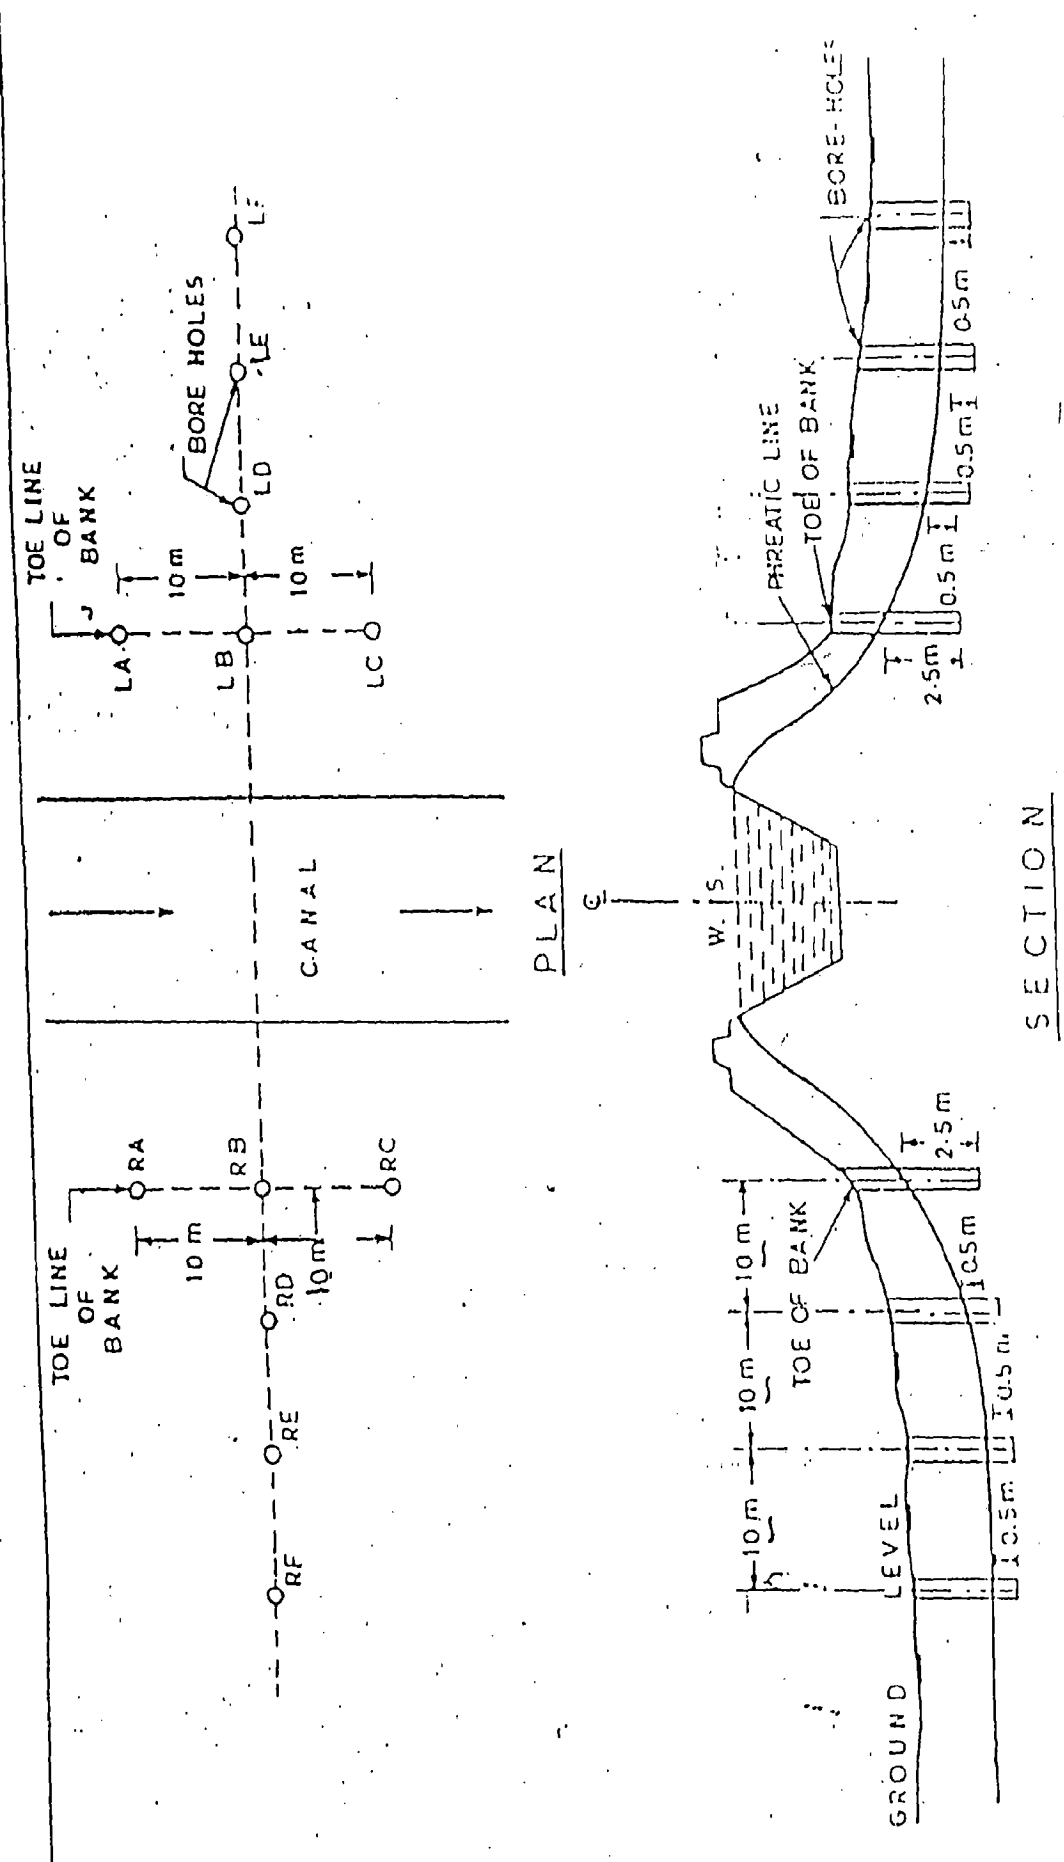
Layout Plan of Borehole Setup for Seepage Measurement
